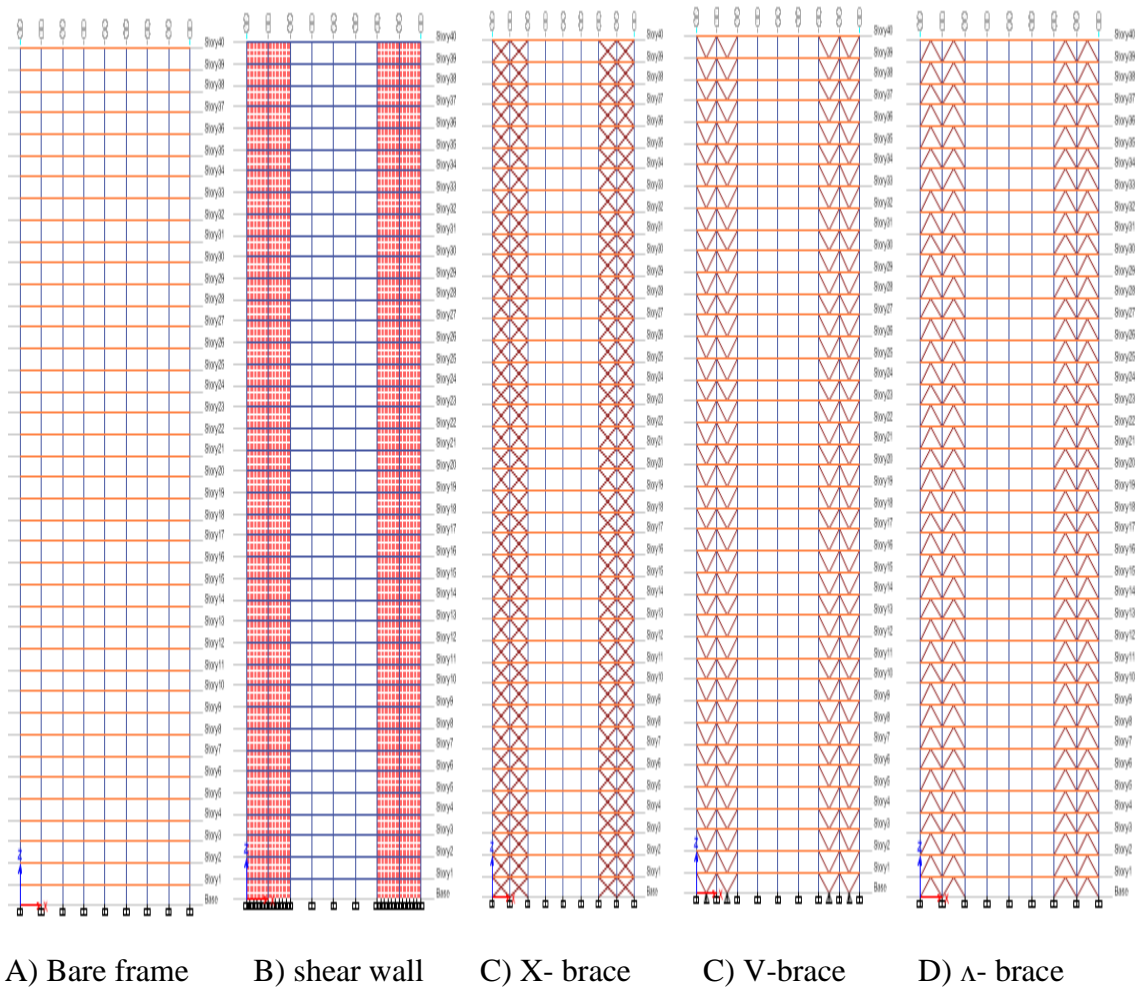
Concrete Framed Model of Building with bare frame, shear wall, X-brace, V-brace and, Δ-brace for the whole modeling, when provided in a double bay
